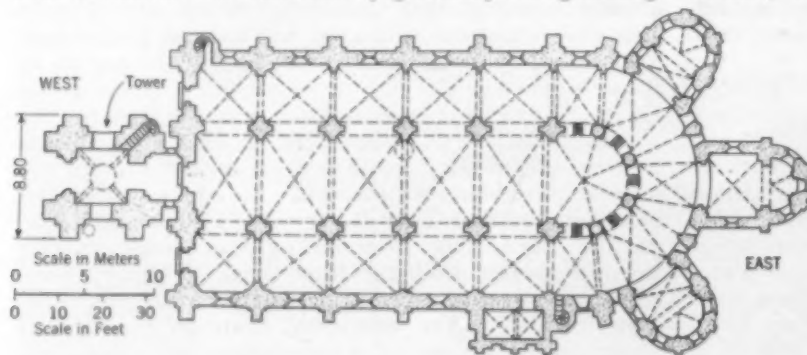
PLAN OF ST. MARTIN'S TOWER AND CHURCH, ETAMPES, FRANCE
